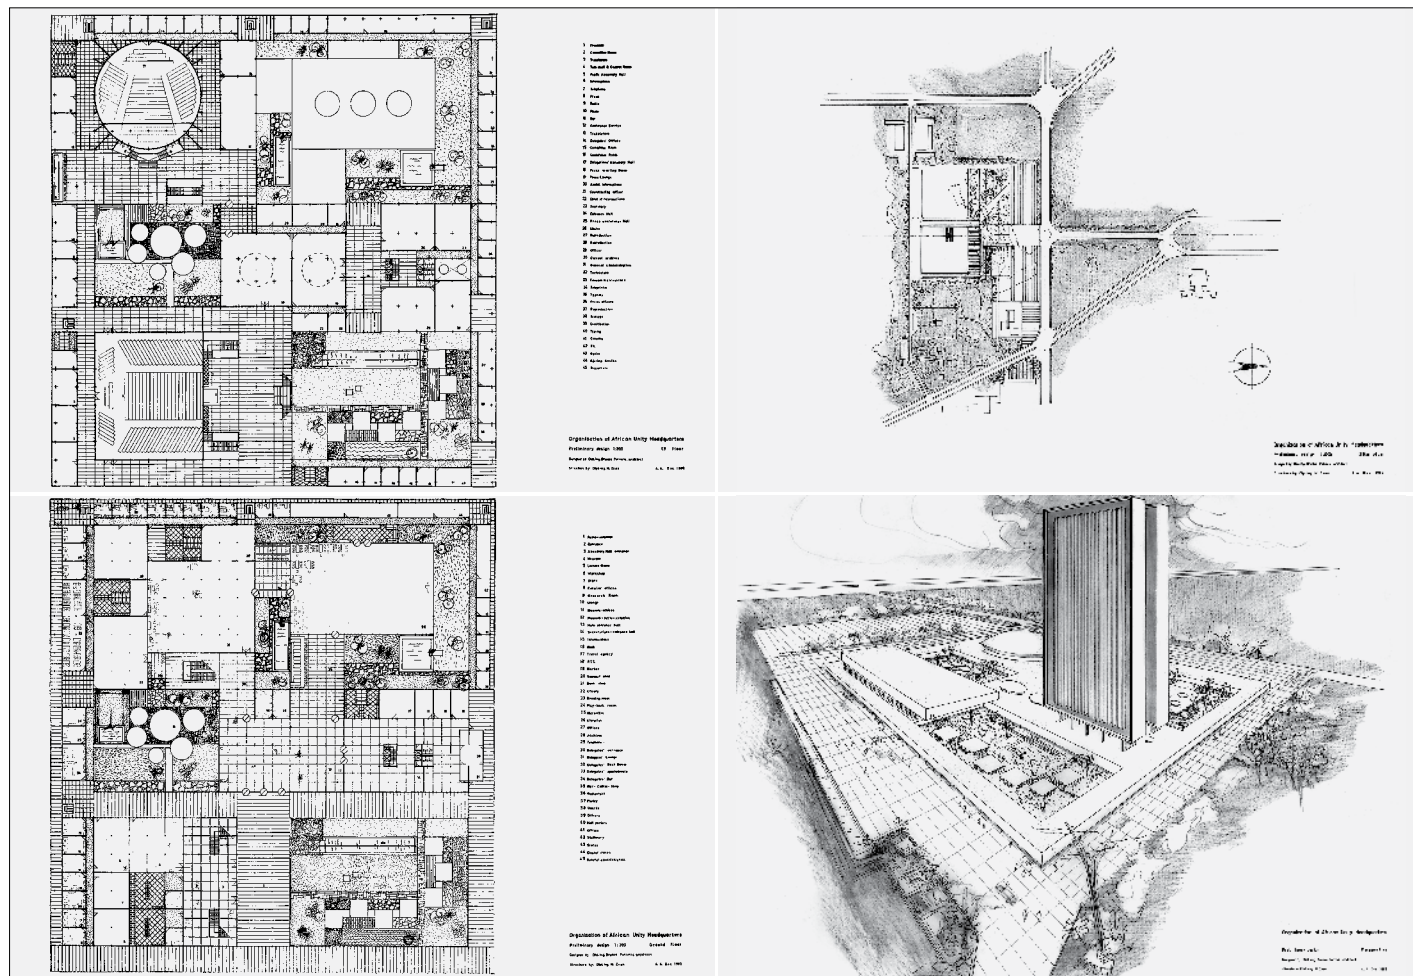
B. PETROVIĆ, ORGANISATION OF AFRICAN UNITY HEADQUARTERS, ADDIS ABABA, ETHIOPIA, PROJECT, 1965: TOP DOWN, FROM LEFT TO RIGHT – FIRST FLOOR PLAN, GROUND FLOOR PLAN, LAYOUT PLAN, PERSPECTIVE
